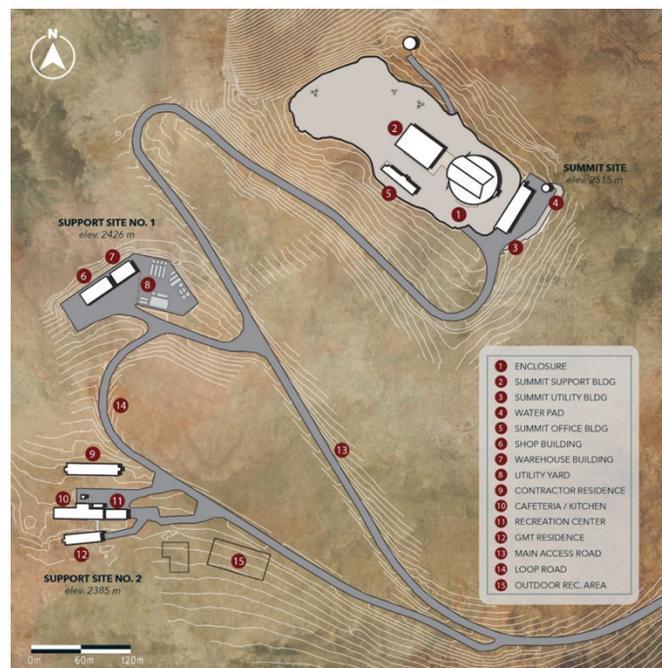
The GMT site master plan, showing the summit site, support site #1 dedicated to shop and warehouse buildings, and the utility yard. support site #2 provides the construction residences, dining and recreation facilities.
